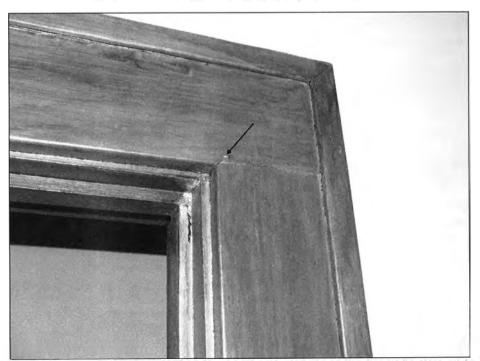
Door frame detail, arrow denotes mortised joint and 45-degree angle that is in line with the door jamb, etc.
